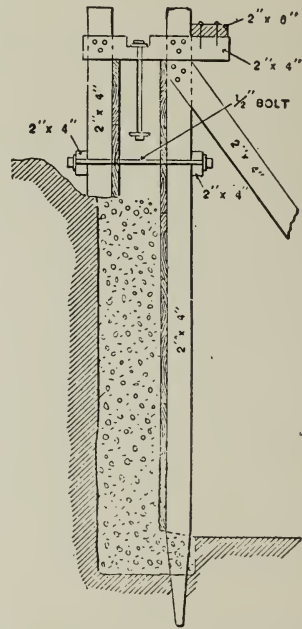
Forms for Concrete Wall Shown in Fig. 482.
